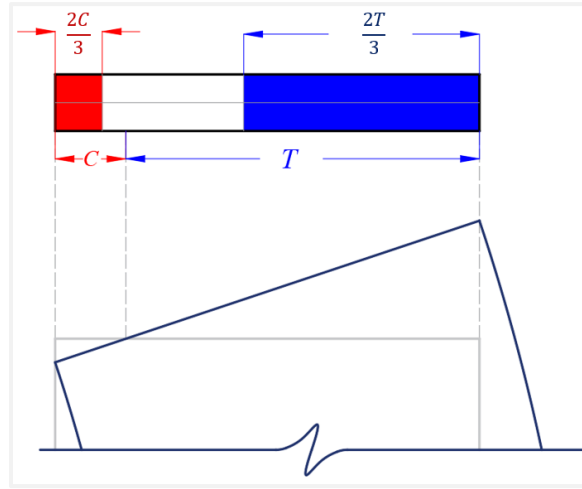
deformation of the wall element with denoted compressive and tensile zones
